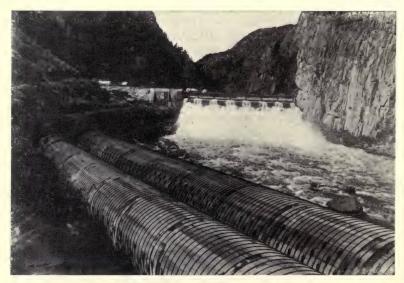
Montana Power Company. Dam and Wooden Penstocks for Madison No. 2 Plant.
